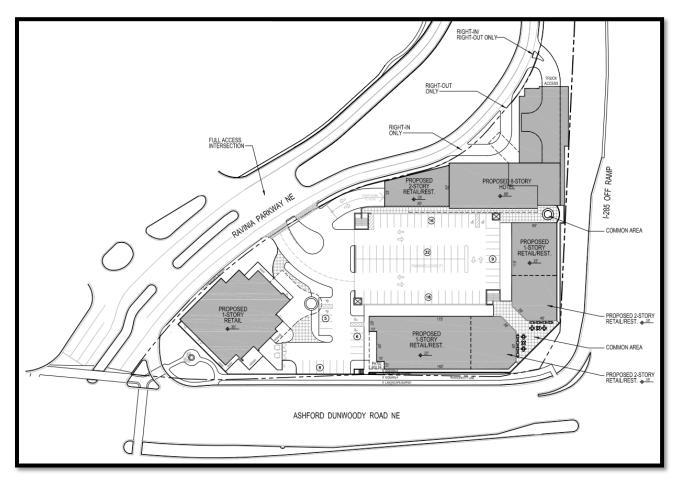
Site Plan for Proposed Ravinia Multi-Use Development
